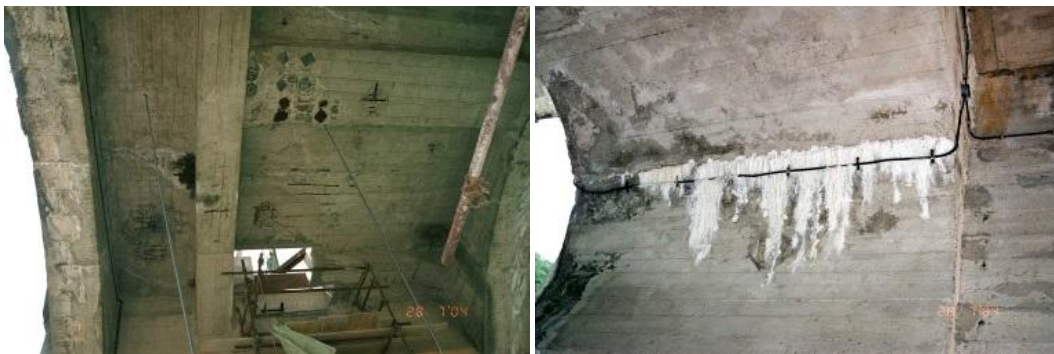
Typical deterioration damages (corrosion, cracks filled with flowstone) in 2004
